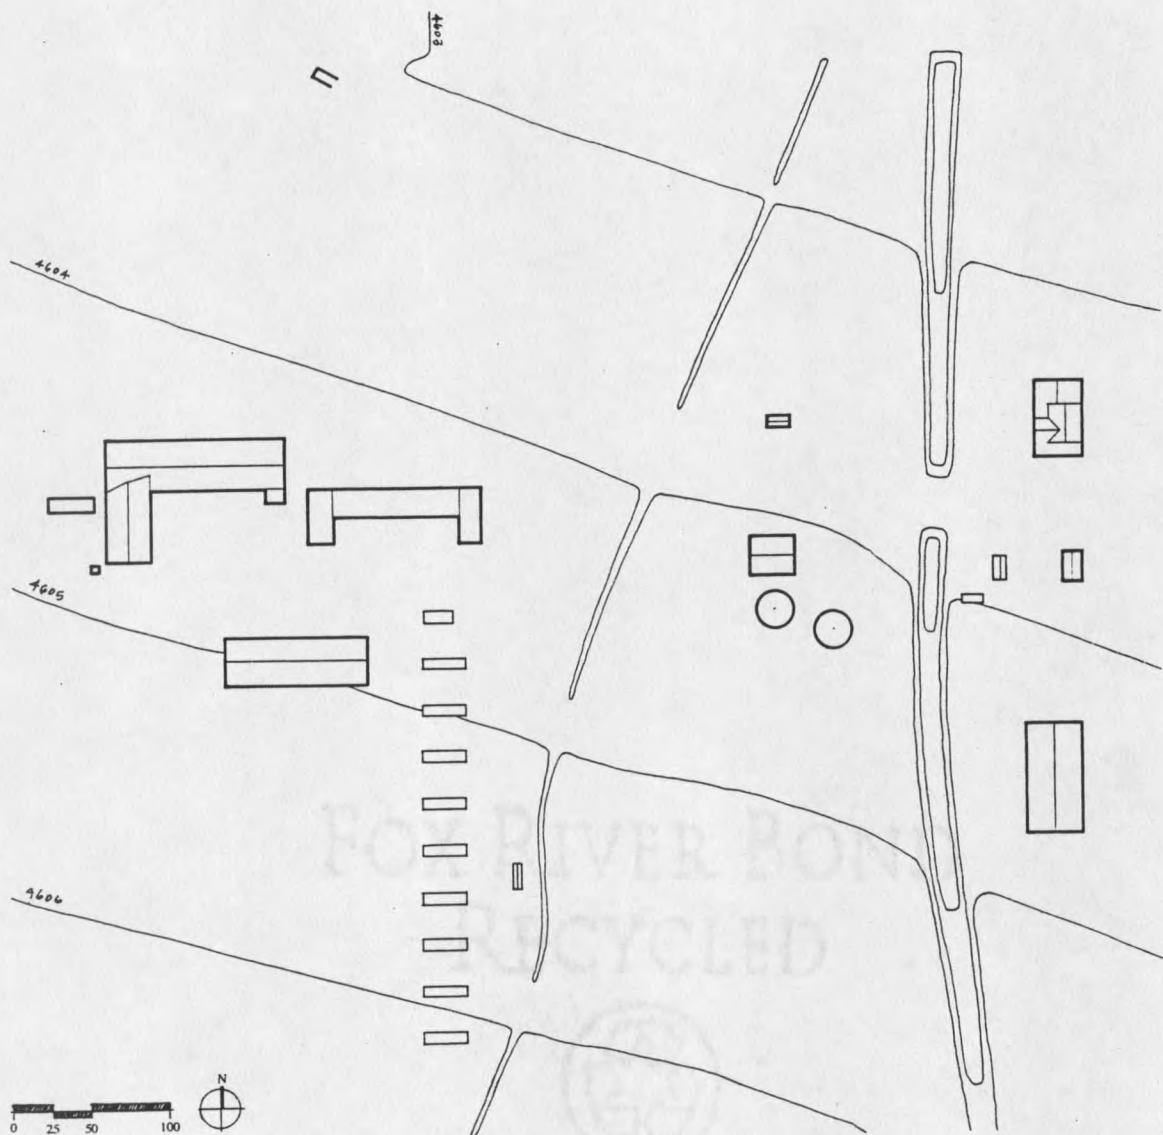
Site #3 - Topographical site plan. Linear building organization across the gradual platform of land, with disused ditch and wider swale cutting through the site.
